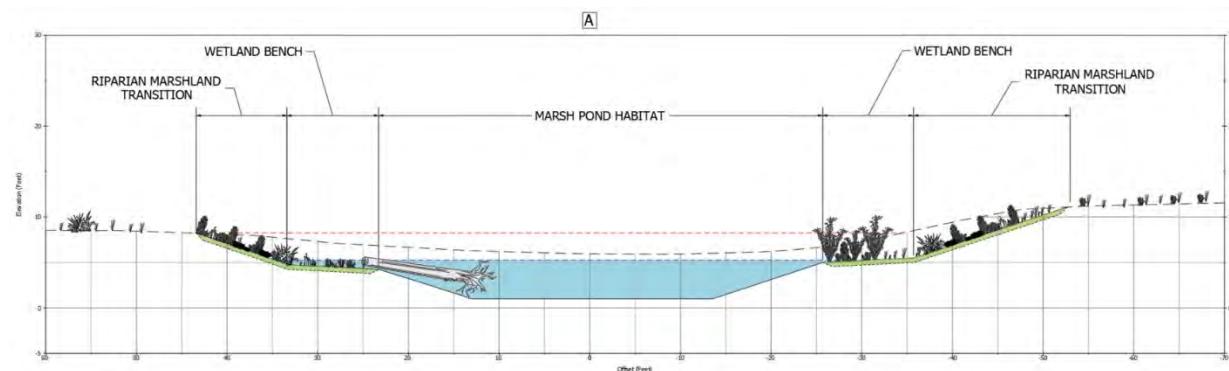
Meadow Creek Lagoon Enhancement Project - 30% Design - Typical section.
